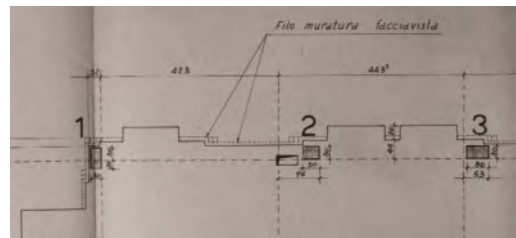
Joist slabs shaped to follow the outline of the façade (Borini’s bottom structural plan, detail 1:50) (ATC, 14563).
